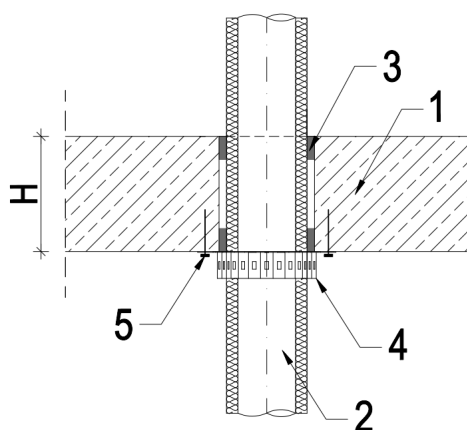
Insulated metal pipe, ceiling penetration, single flange at the bottom of the ceiling
